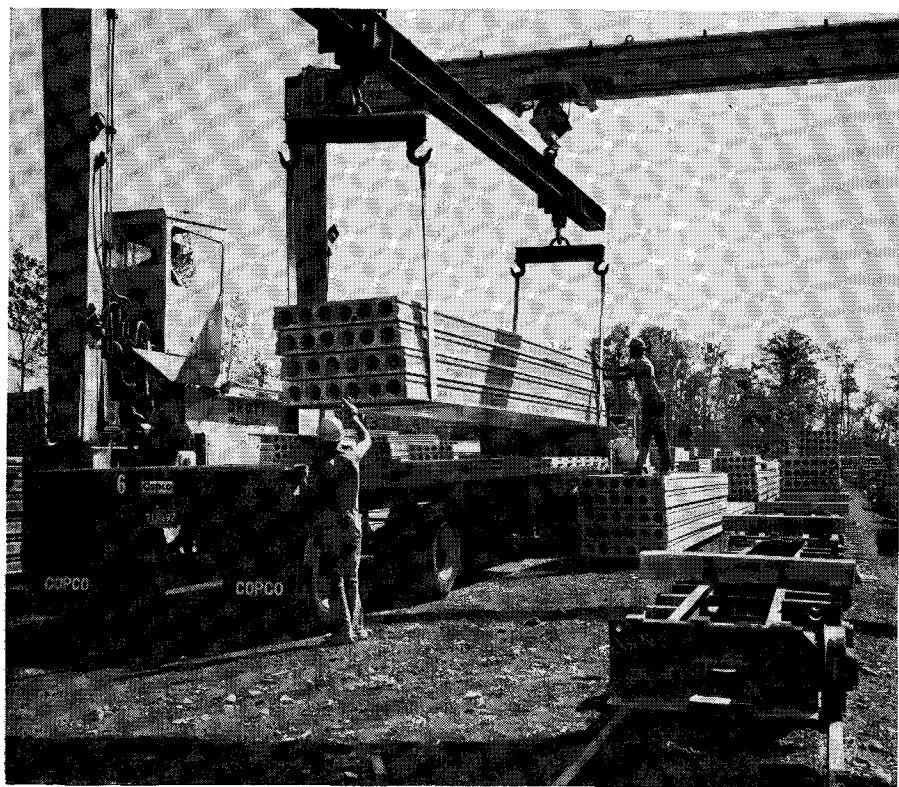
A stack of hollow-core slabs being loaded onto a truck by straddle carrier. Railroad is on right side.
